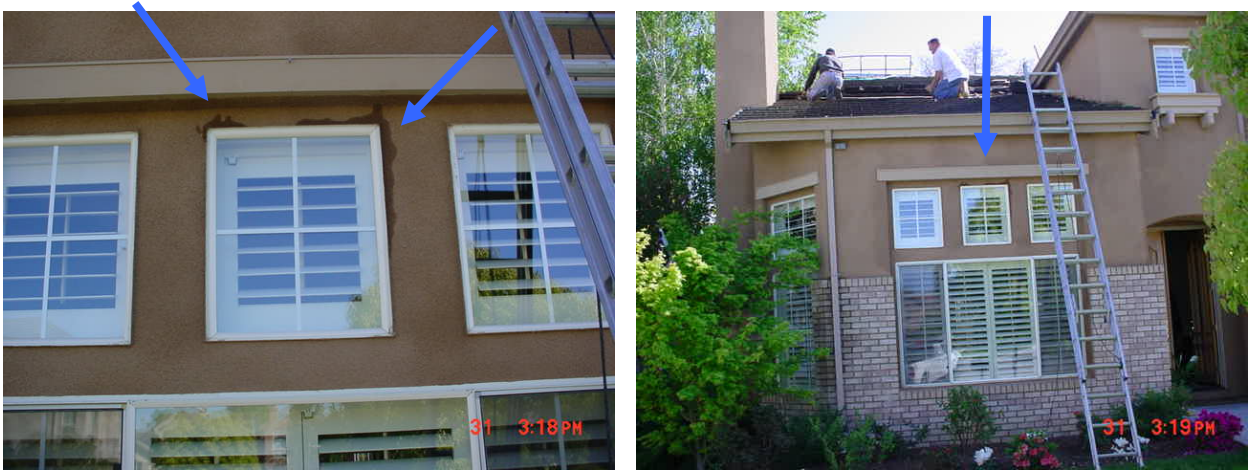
Exterior views of the front of the residence showing the location of water exiting the stucco surrounding the center window (blue arrows), indicating water had entered the wall system above the window.
